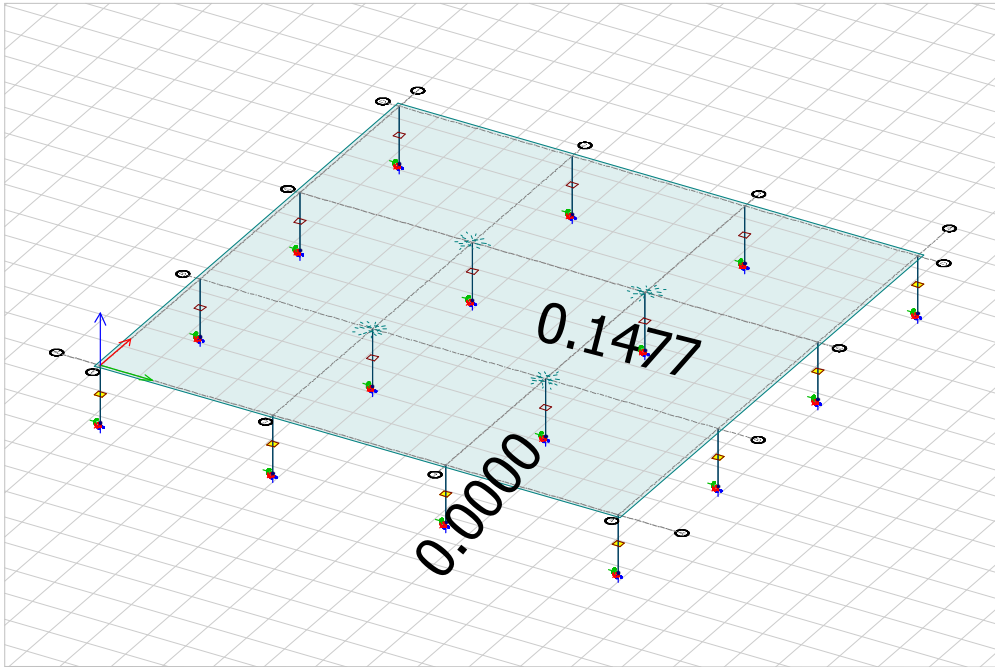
Cracking considered - RC shell - Crack width - top - Load comb.: SLS - [mm]
